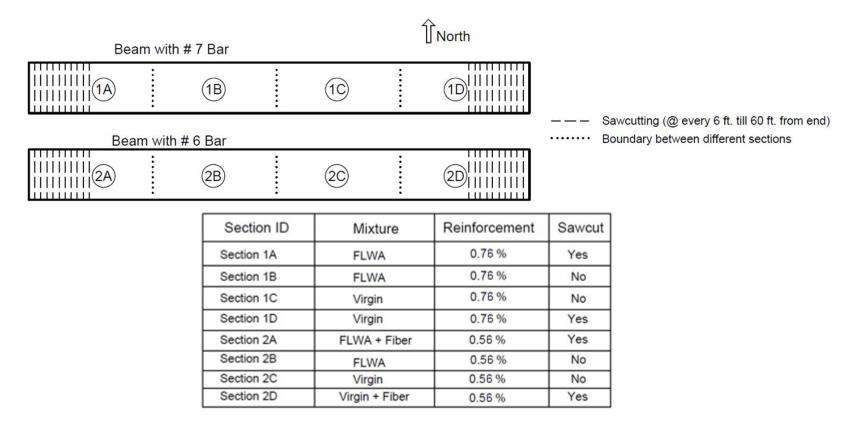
Top view of beams with section name (top); nomenclature of different sections with key mixture, reinforcement, and sawcut details (bottom).
